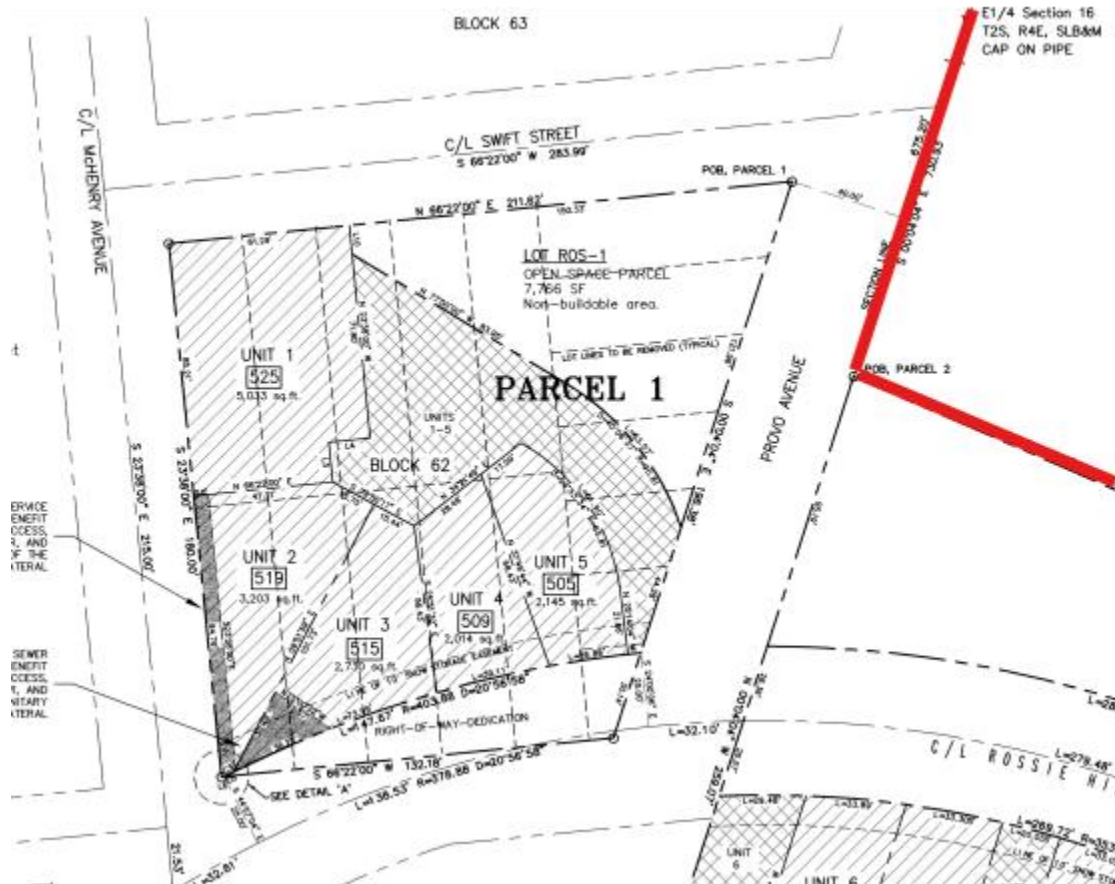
Excerpt from the Silver Pointe Condos Plat showing platted but unbuilt Provo Avenue and Swift Street. 430 Deer Valley Loop is not shown on this plat but is outlined in red adjacent to the platted areas.
